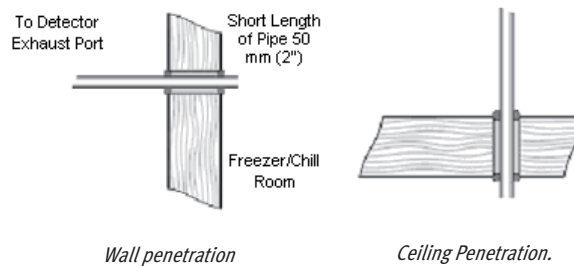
Examples of a System Sensor exhaust pipe being fed back into the area from which the air sample was taken.
